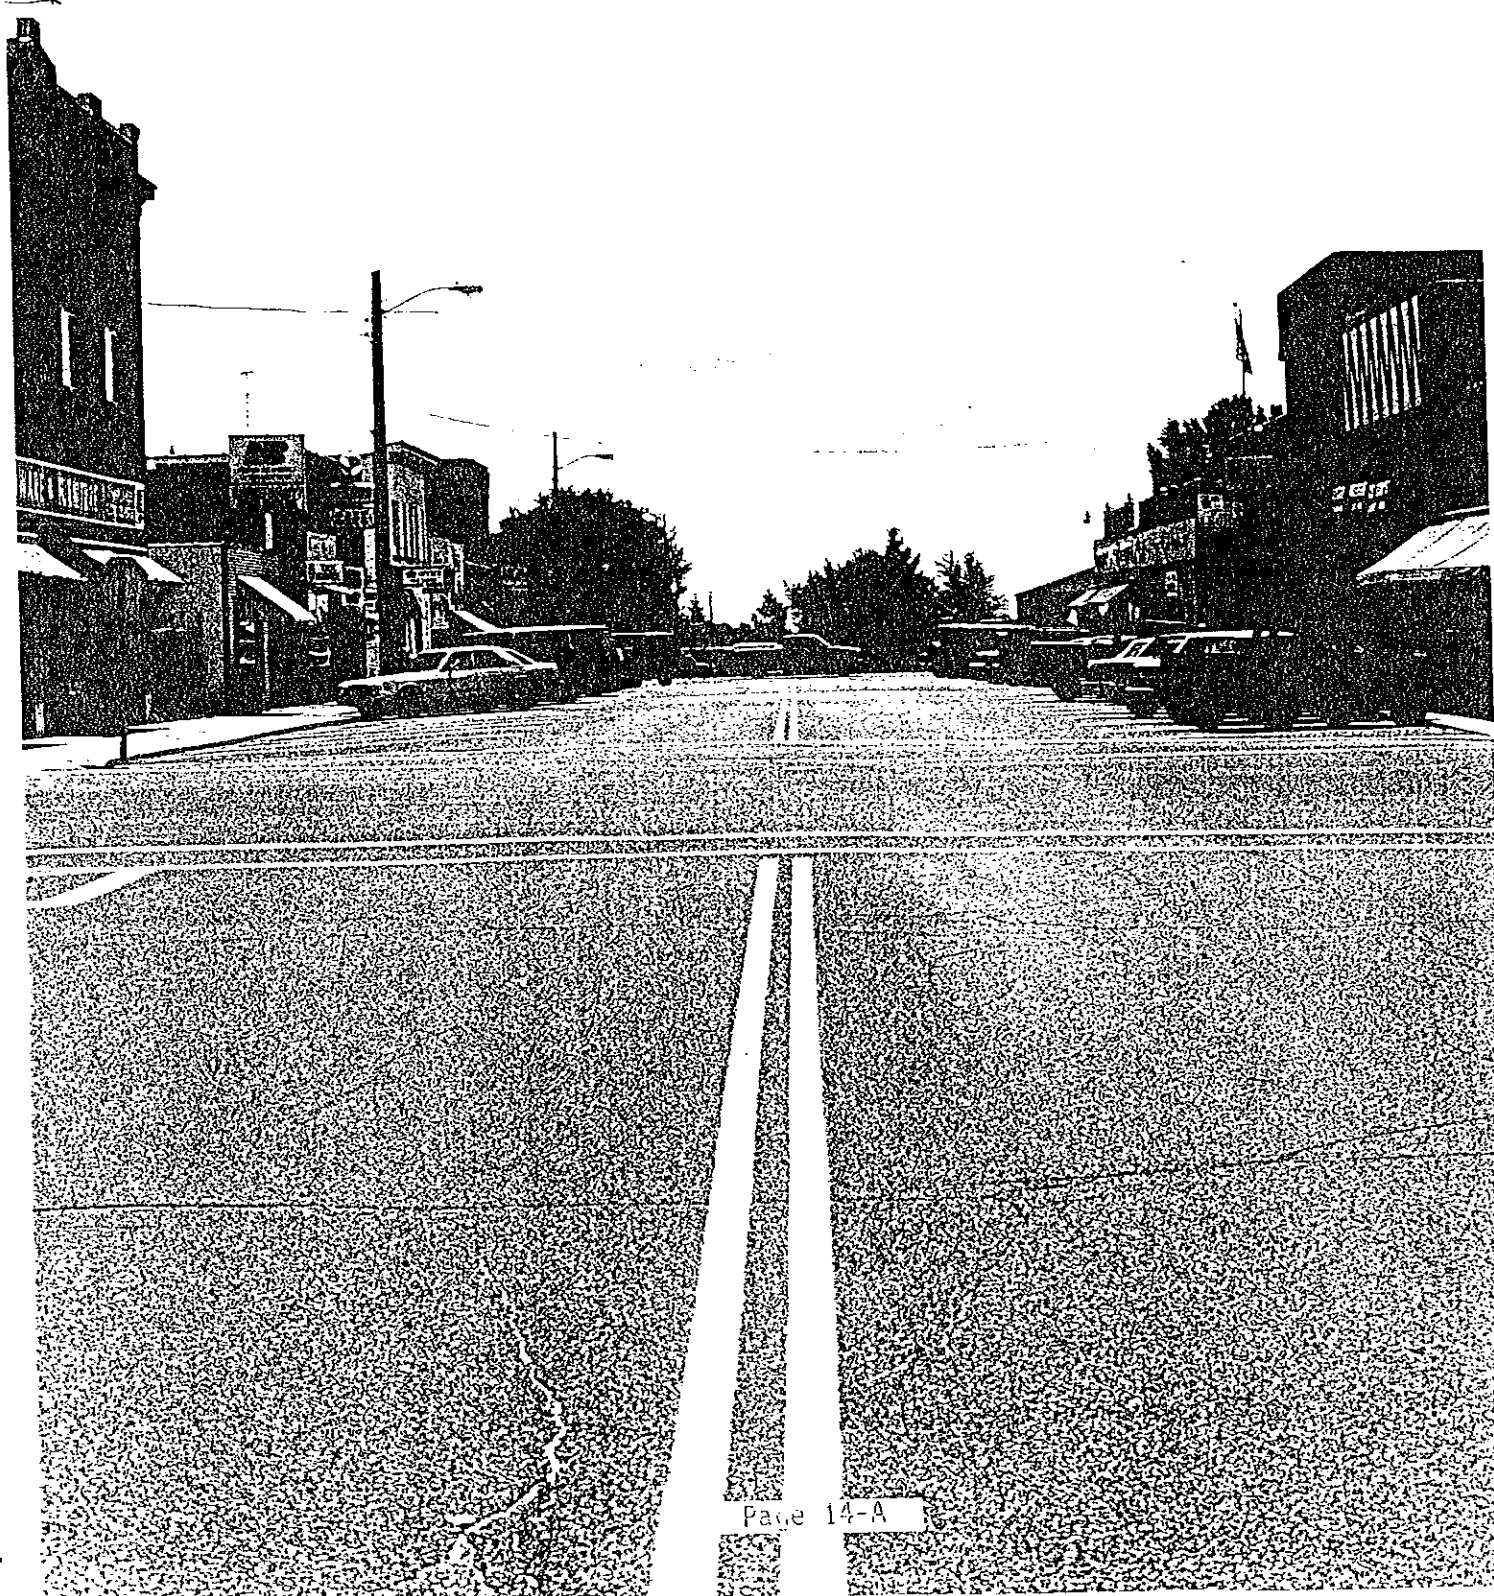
Central Business District: Corner of 4th Avenue & Dewey Street, looking northwest
